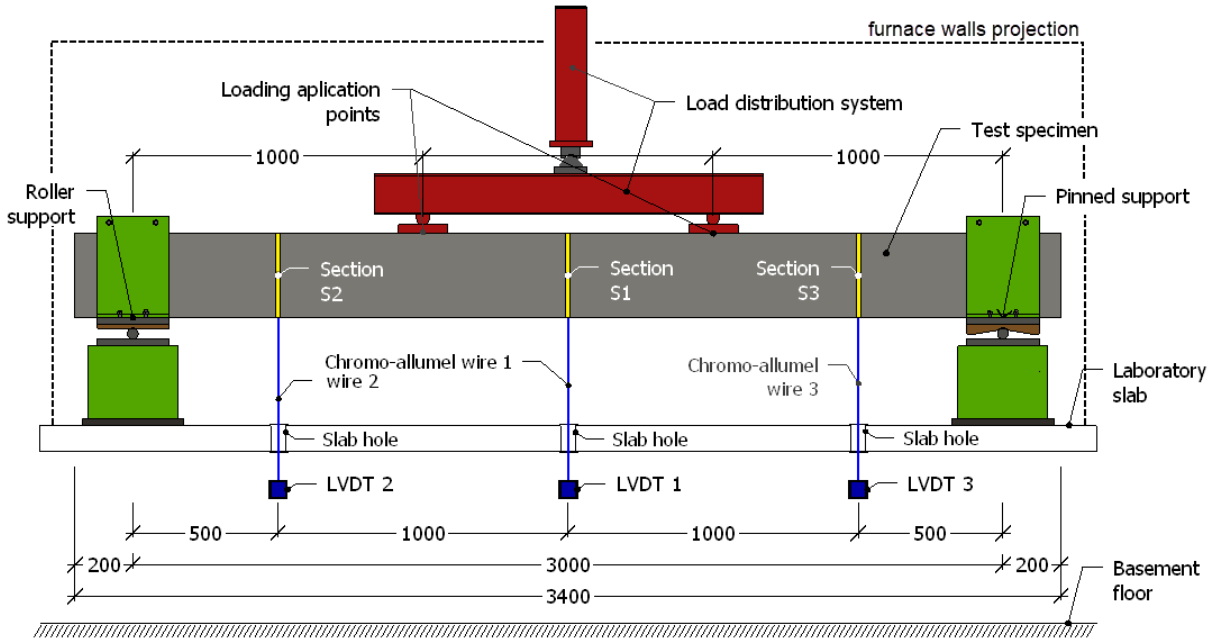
Schematic view of test set-up with location of measuring points and other details
